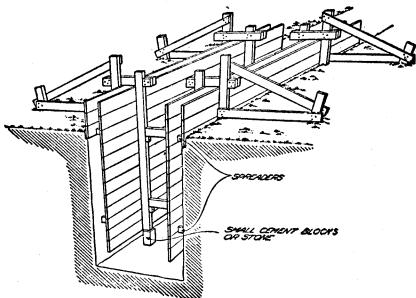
Section of trench for concrete vat with perpendicular sides, showing the forms in place and a different method of bracing from that shown in figure 14.
